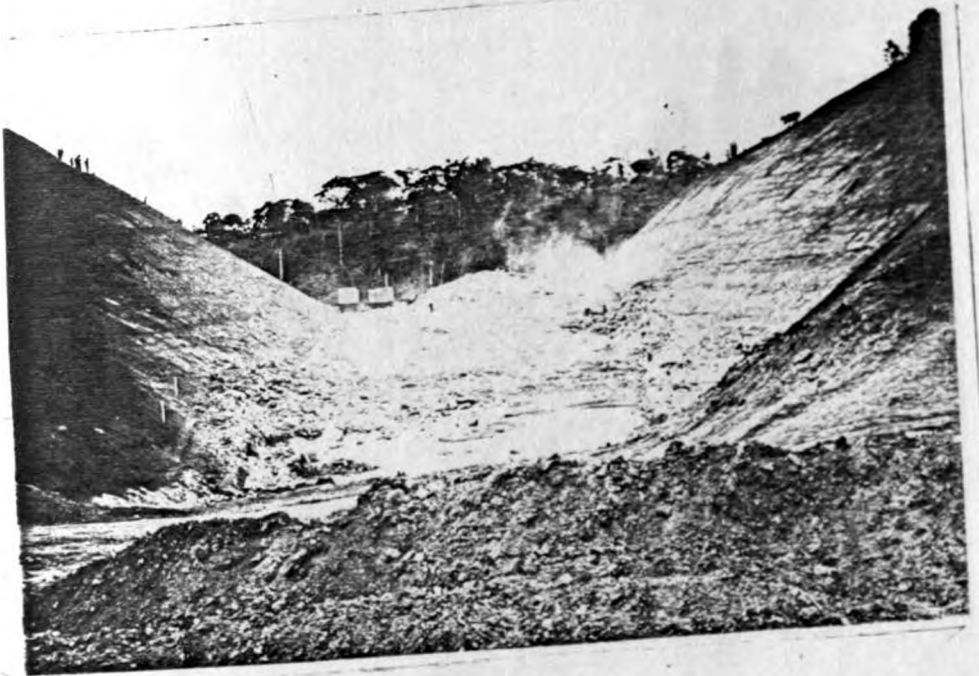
Thuci/Nkubu section of the B6 (Embu-Meru) Road is currently under construction.
